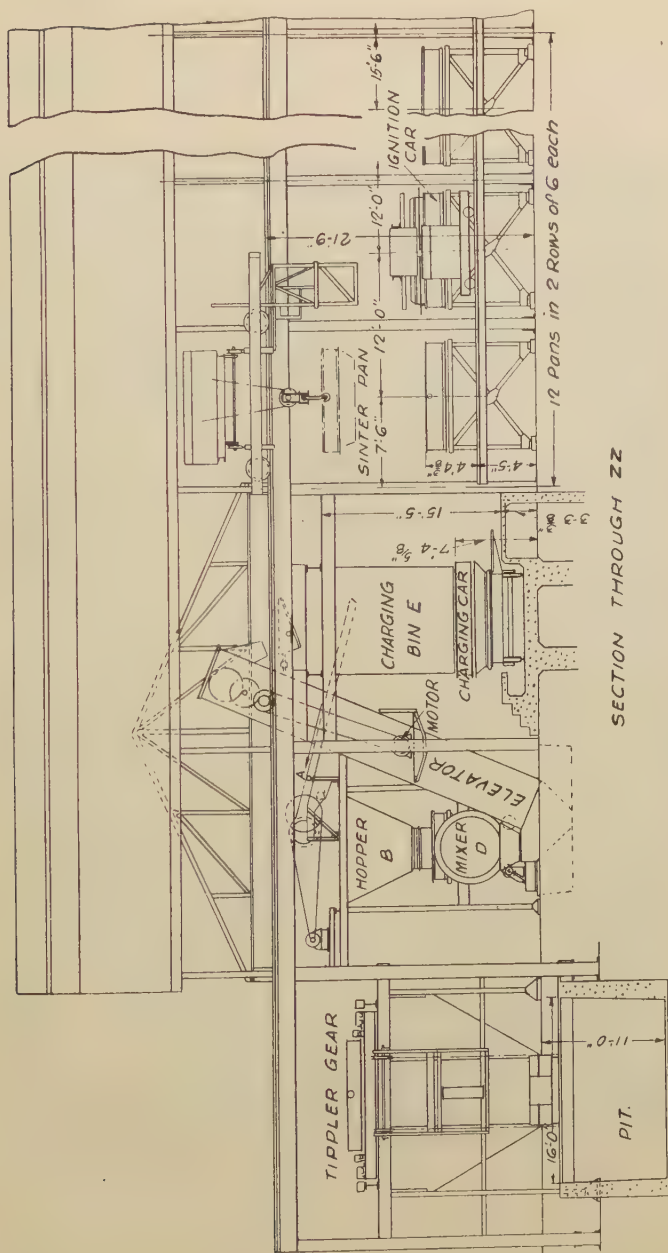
Sectional Elevation showing the Elevator and Charging Bunker.
